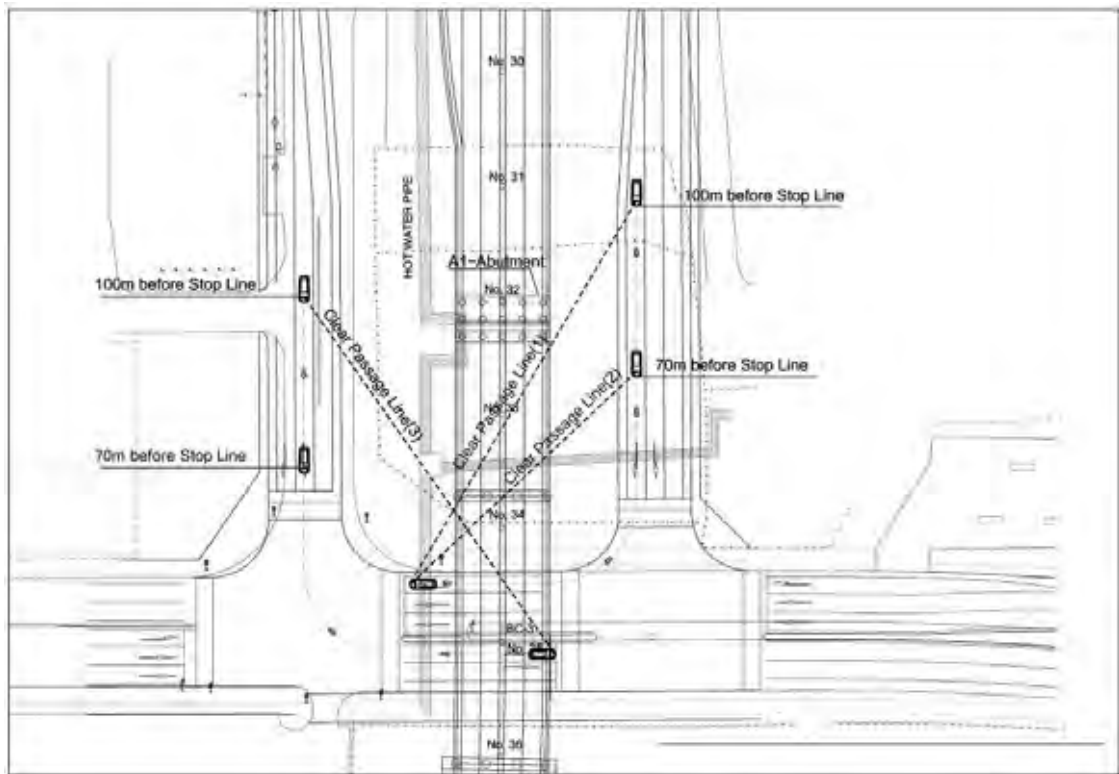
Location of A1 Abutment and Driver's Visibility at Intersection
